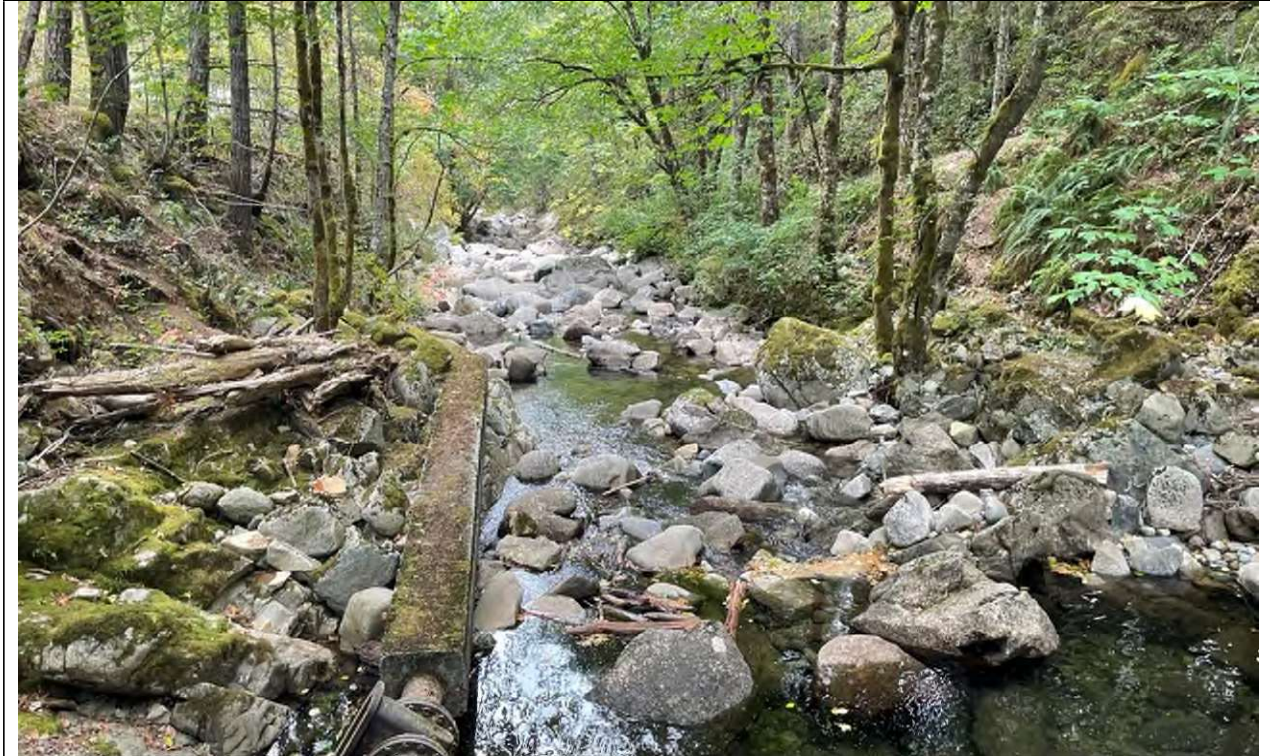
Date: 19 September 2023	Looking Towards: North	Location: Downstream of Colonia Drive Dam
